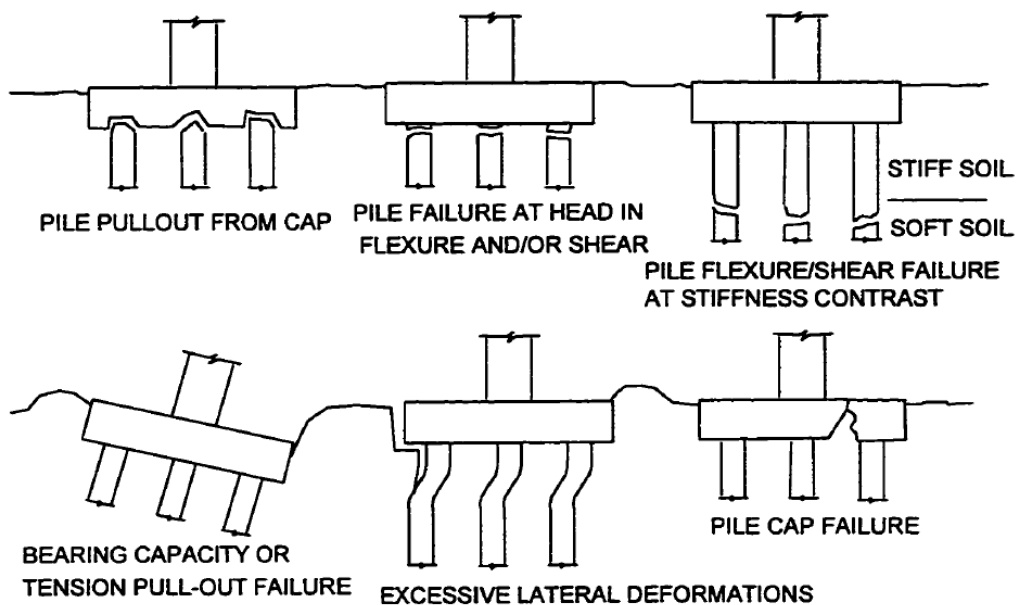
Possible failure modes for pile foundations under seismic shaking [62]
